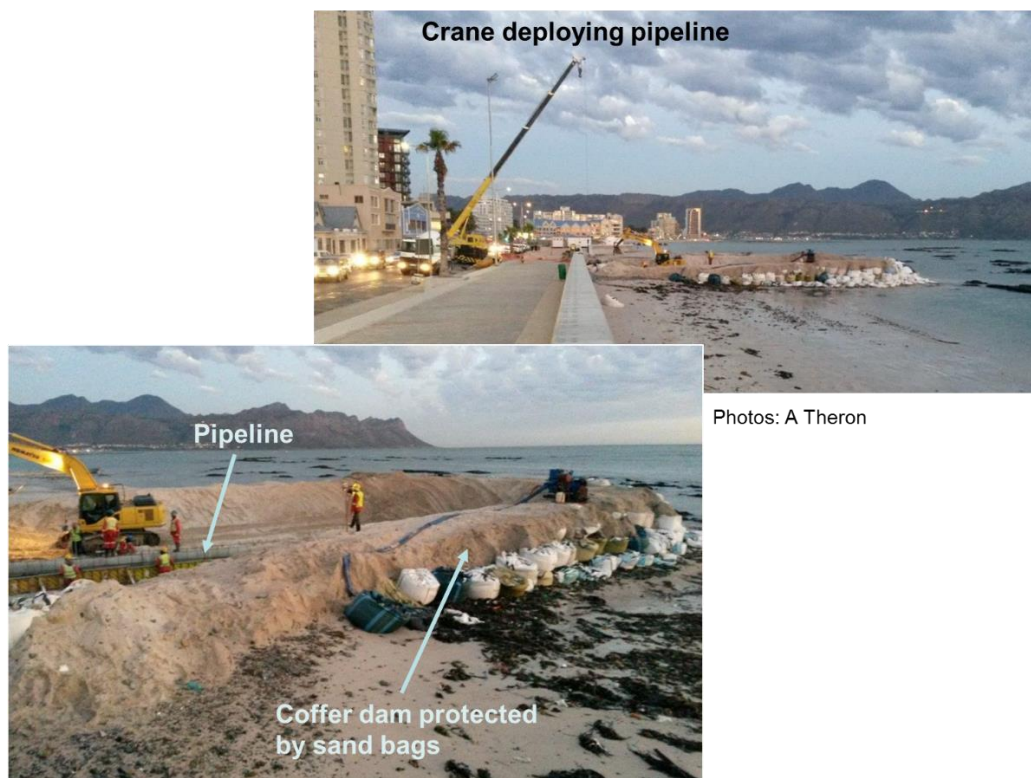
Example of coastal construction works protected by a temporary sand wall and sand bag construction. (Photo: A Theron, False Bay, 2016)
